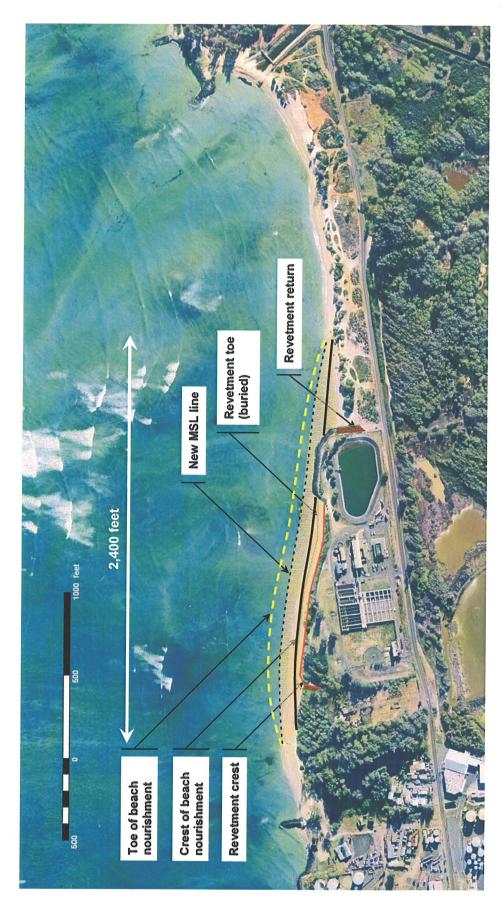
Plan view of Revetment Alternative 3B (With Beach Replenishment)
